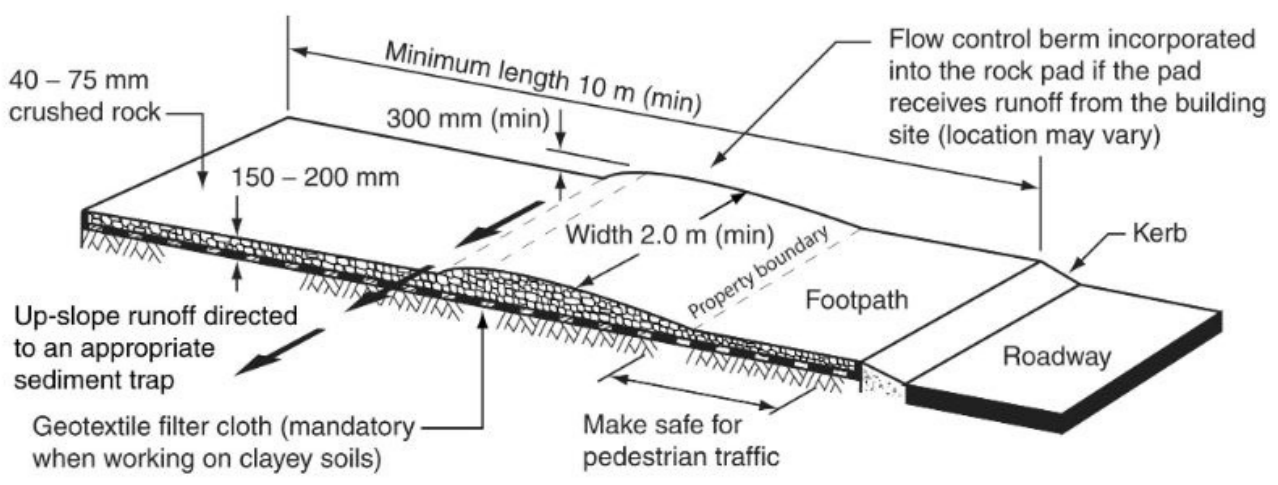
Dimensions and construction details for rock entry/exit pad for small building sites. For large construction sites the minimum length of stabilised site access structures is 15 metres, and a minimum width of 3 metres. *Figure from Catchments and Creeks Pty Ltd.
